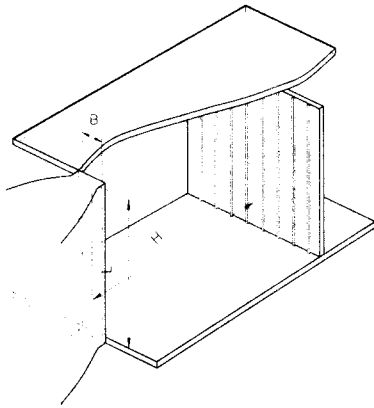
Geometrical parameters of the system of flat plate with rods(side view)
